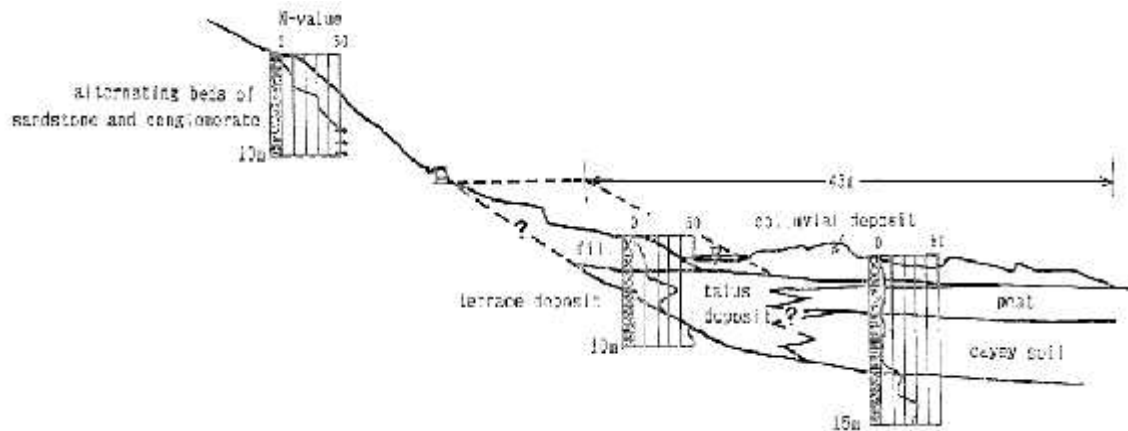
Route 44 Itoizawa road embankment failure (from Sasaki et al. 1993)
